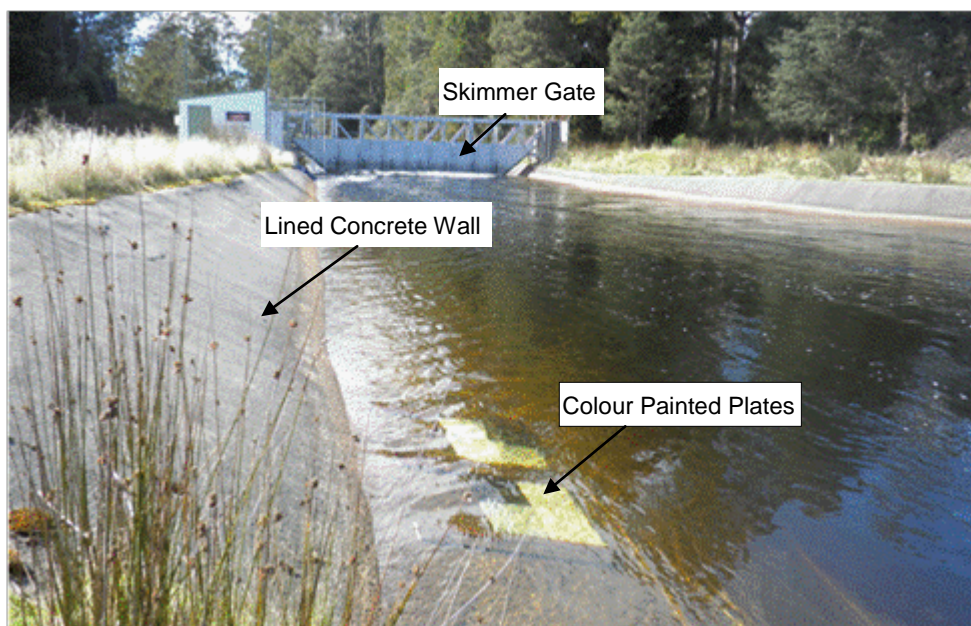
Plates with different colours were located on the concrete wall at Pond No. 1.
